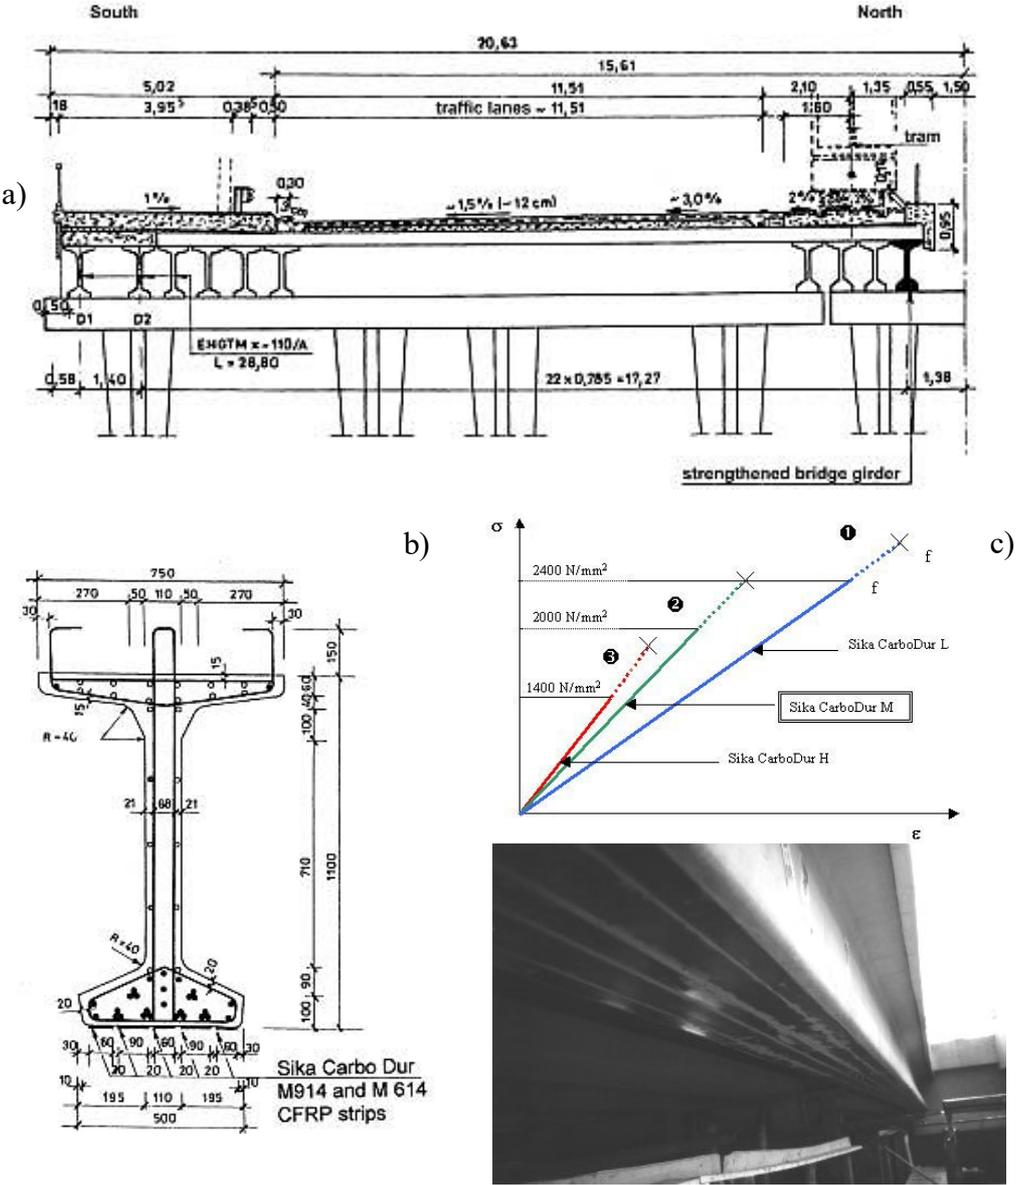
Strengthening of a prefabricated prestressed pre-tensioned concrete bridge girder in Budapest, Petöfi bridge owing to the corrosion of five prestressing strands (Balázs, Almakt, 2000)
